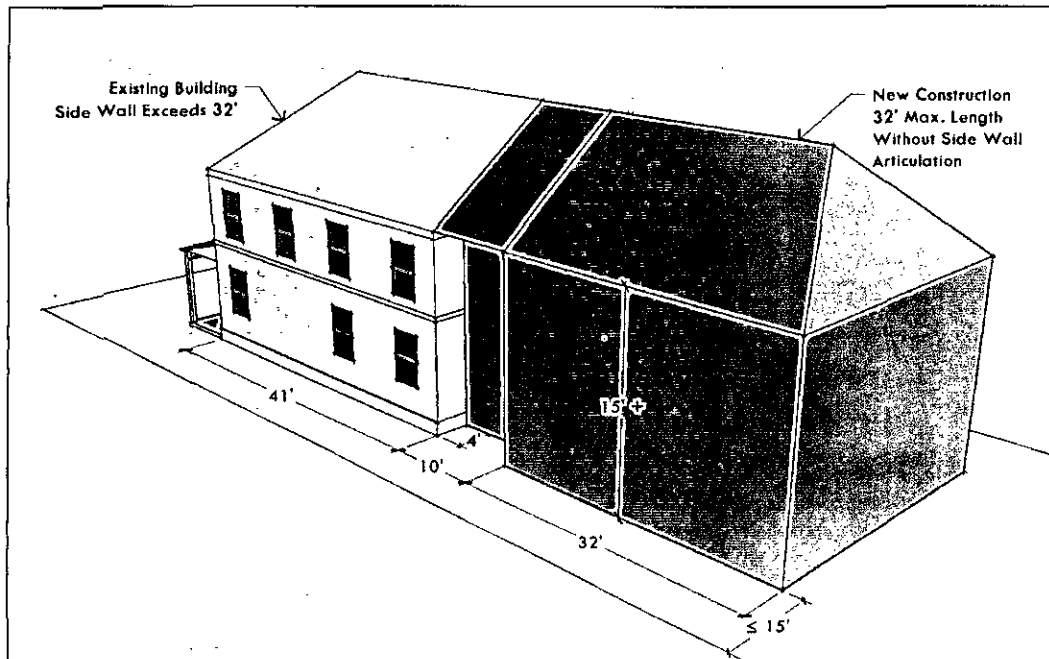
Side Wall Articulation (Existing Side Wall Exceeds 32 Feet)
